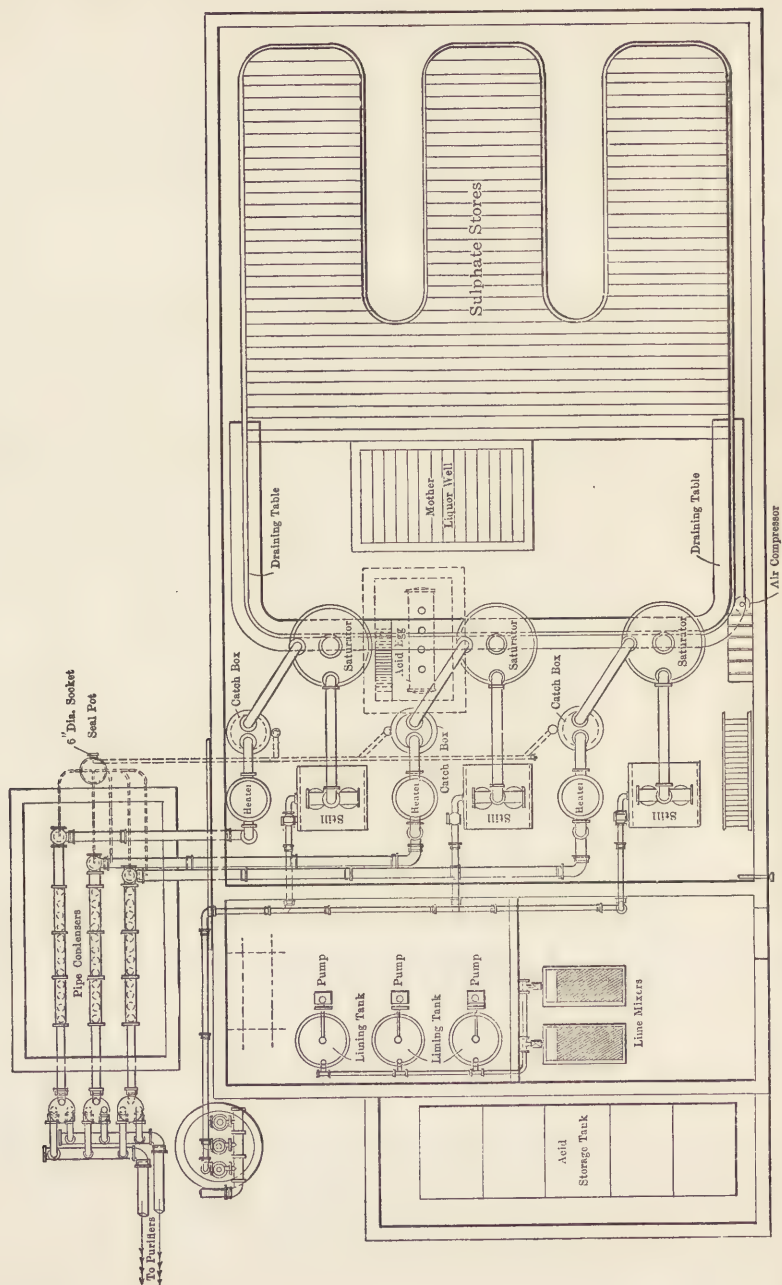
SULPHATE OF AMMONIA PLANT BY JOHN H. DARBY, GROUND PLAN.
